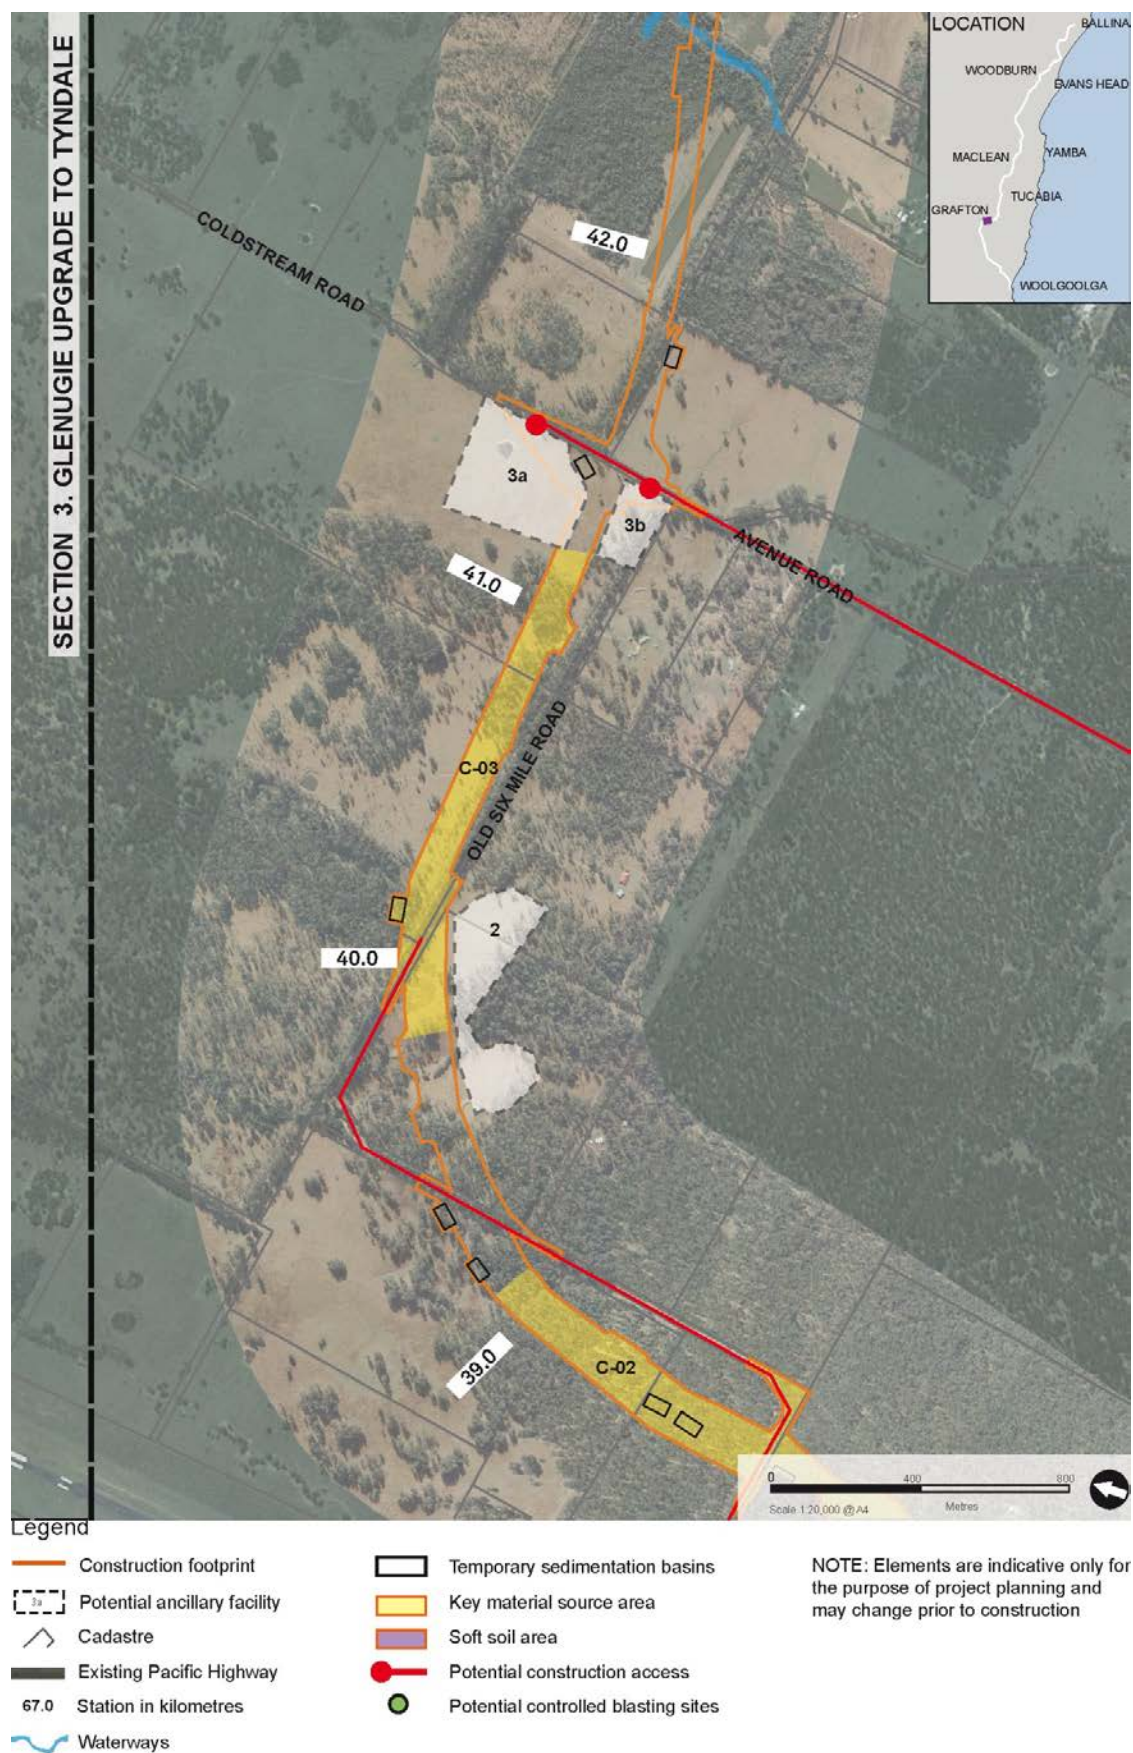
Extent of construction and construction features Section 3 (Station 36.8 to 42.6)
